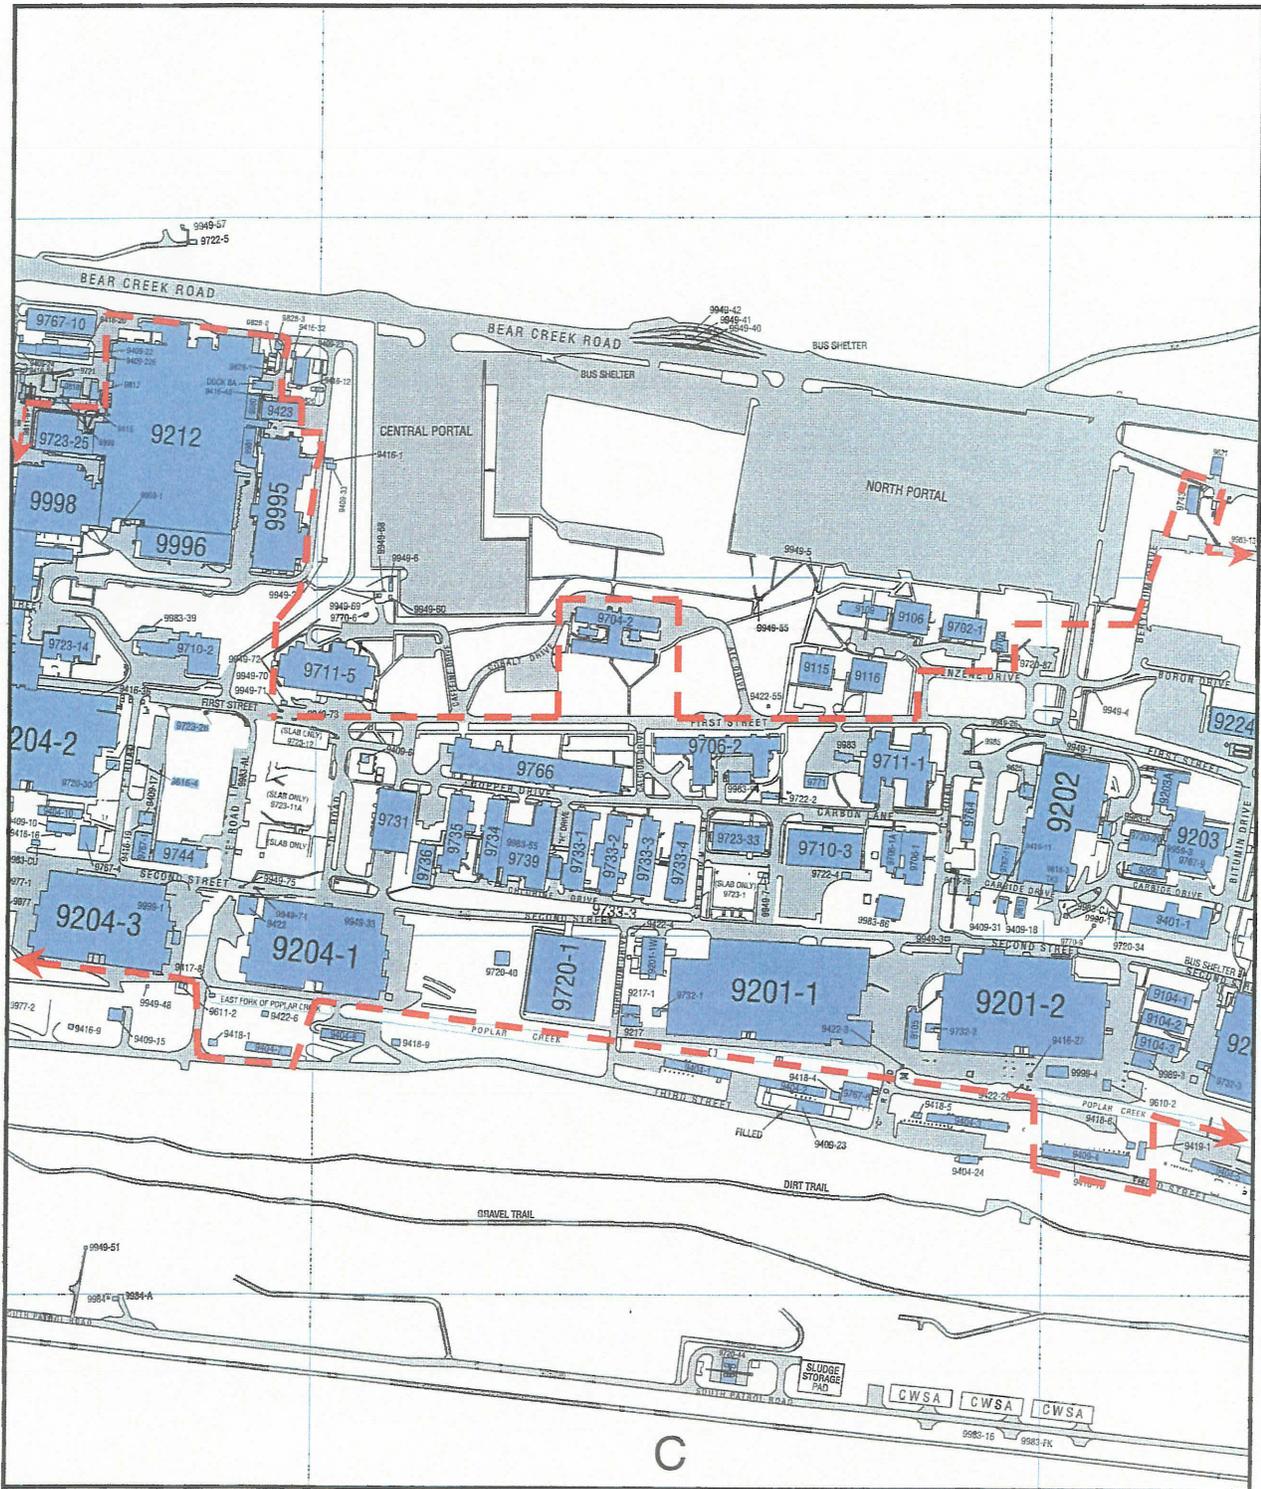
The central section of the Y-12 Complex would have this appearance if all of the buildings currently proposed for demolition were removed. The primary buildings removed in this section of the plant are 9206, and 9720-17. The proposed Y-12 Historic District is outlined in red.
